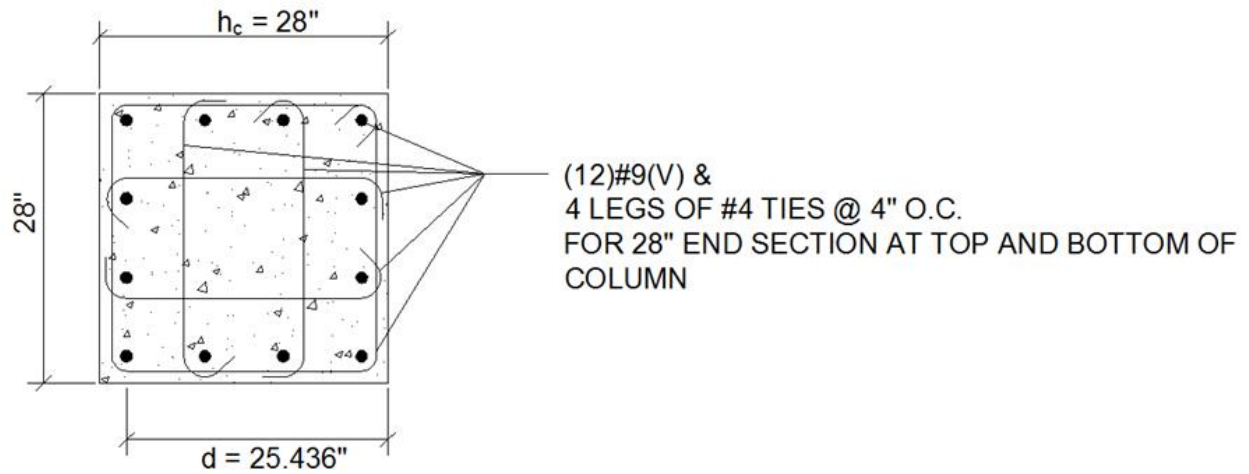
Exterior column, cross section at end of column at the 3rd floor level based on tsunami design requirements.
